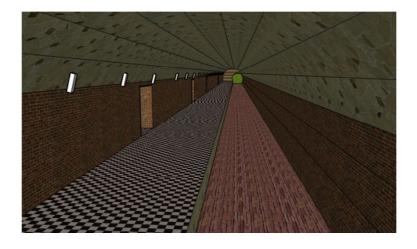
16 Sketch Up Pro Plat- 1 internal view of geometrical model showing the surfaces, loudspeaker arrangement, cross passages and a tunnel opening.
